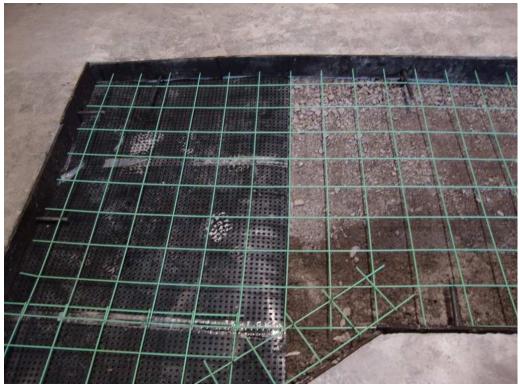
View of dowels, mesh, and drainage board at northern corner of trench (Looking East AM)
